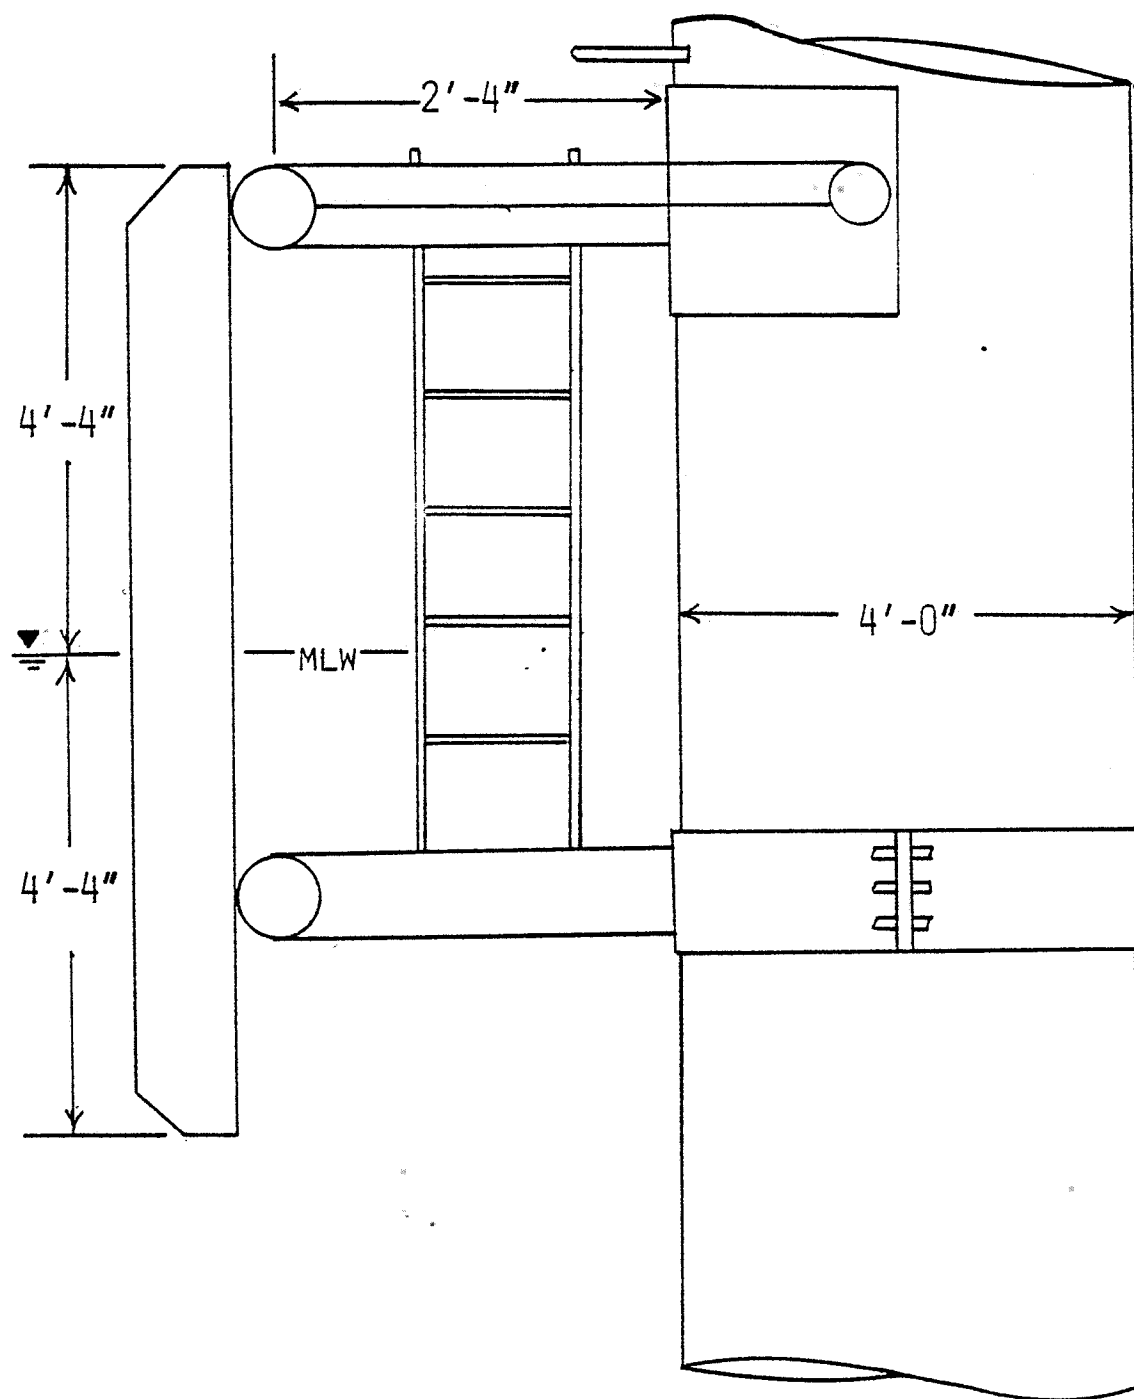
ELEVATION VIEW OF BOAT LANDING AND CAISSON
